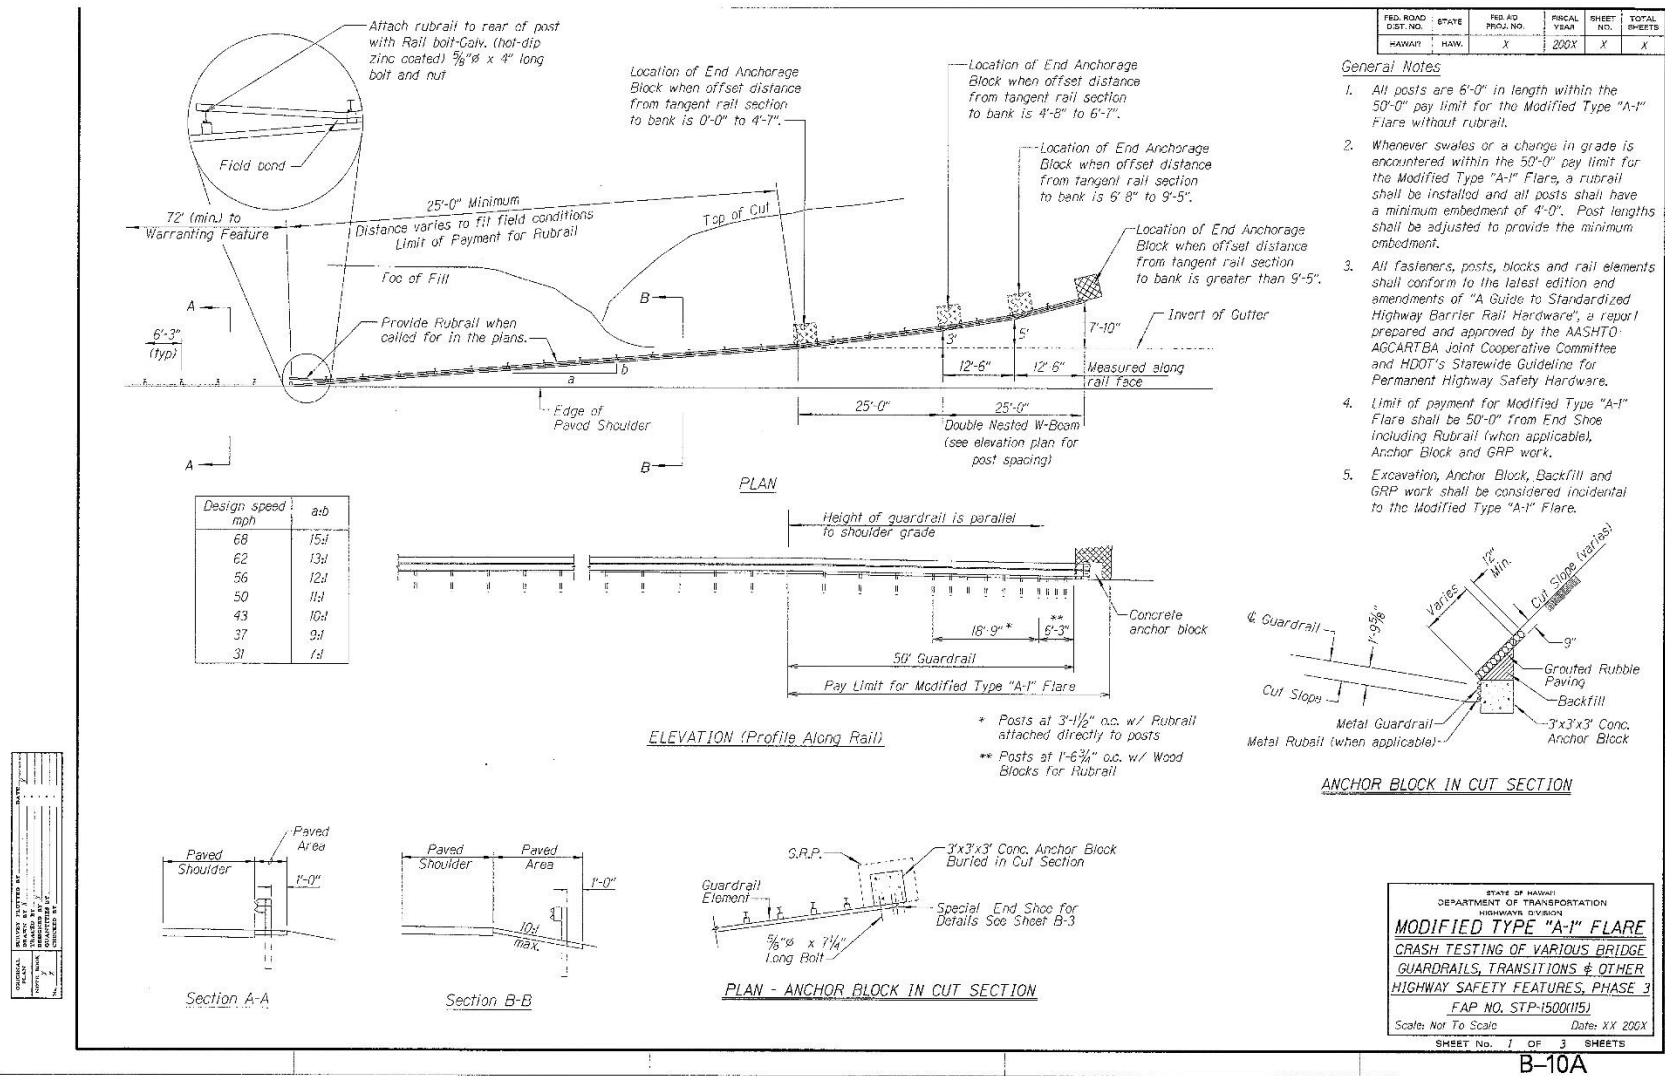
HDOT Standard Plans - HBIB Modified Type A-1 Flare, Sheet 1
